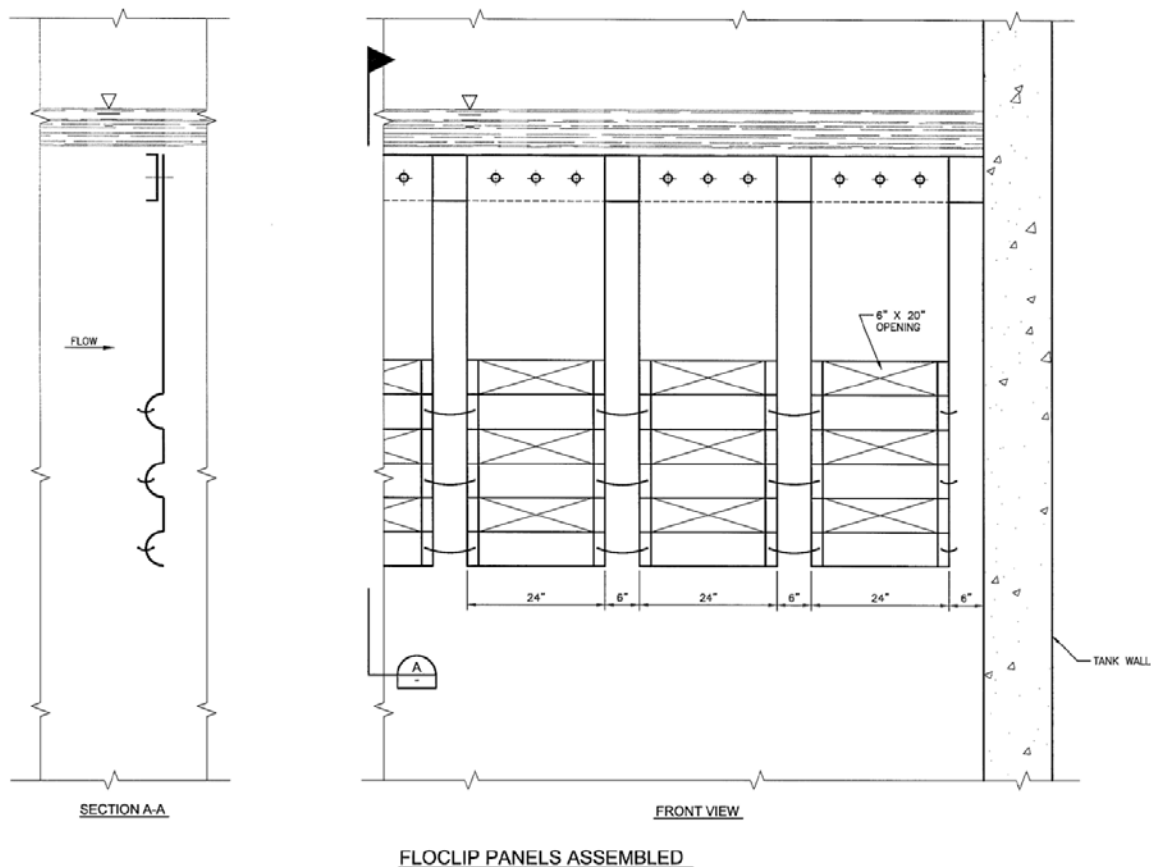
FRONT VIEWS AND CROSS SECTION OF FLOCLIP Baffle SYSTEM
